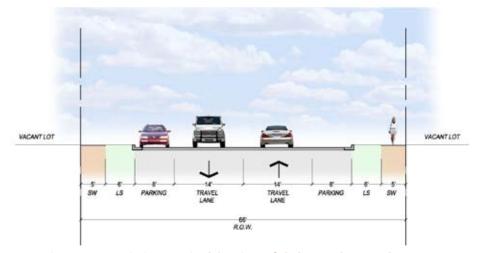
Existing Typical Section of Calumet Avenue between 42nd Street and 44th Street
